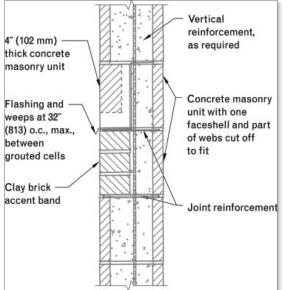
Multi-course clay brick band in reinforced concrete masonry single wythe wall.
